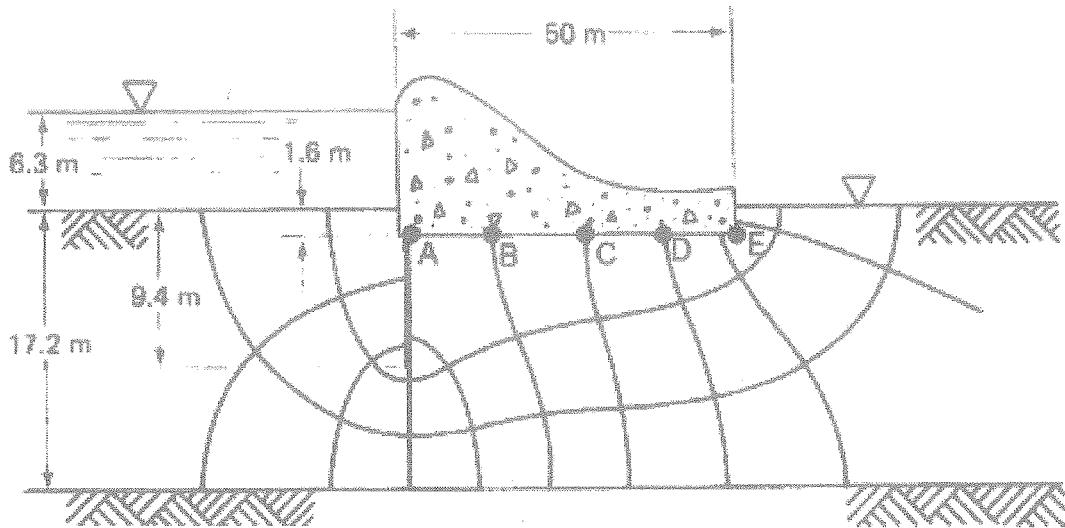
Flow net for the concrete dam and cutoff wall
